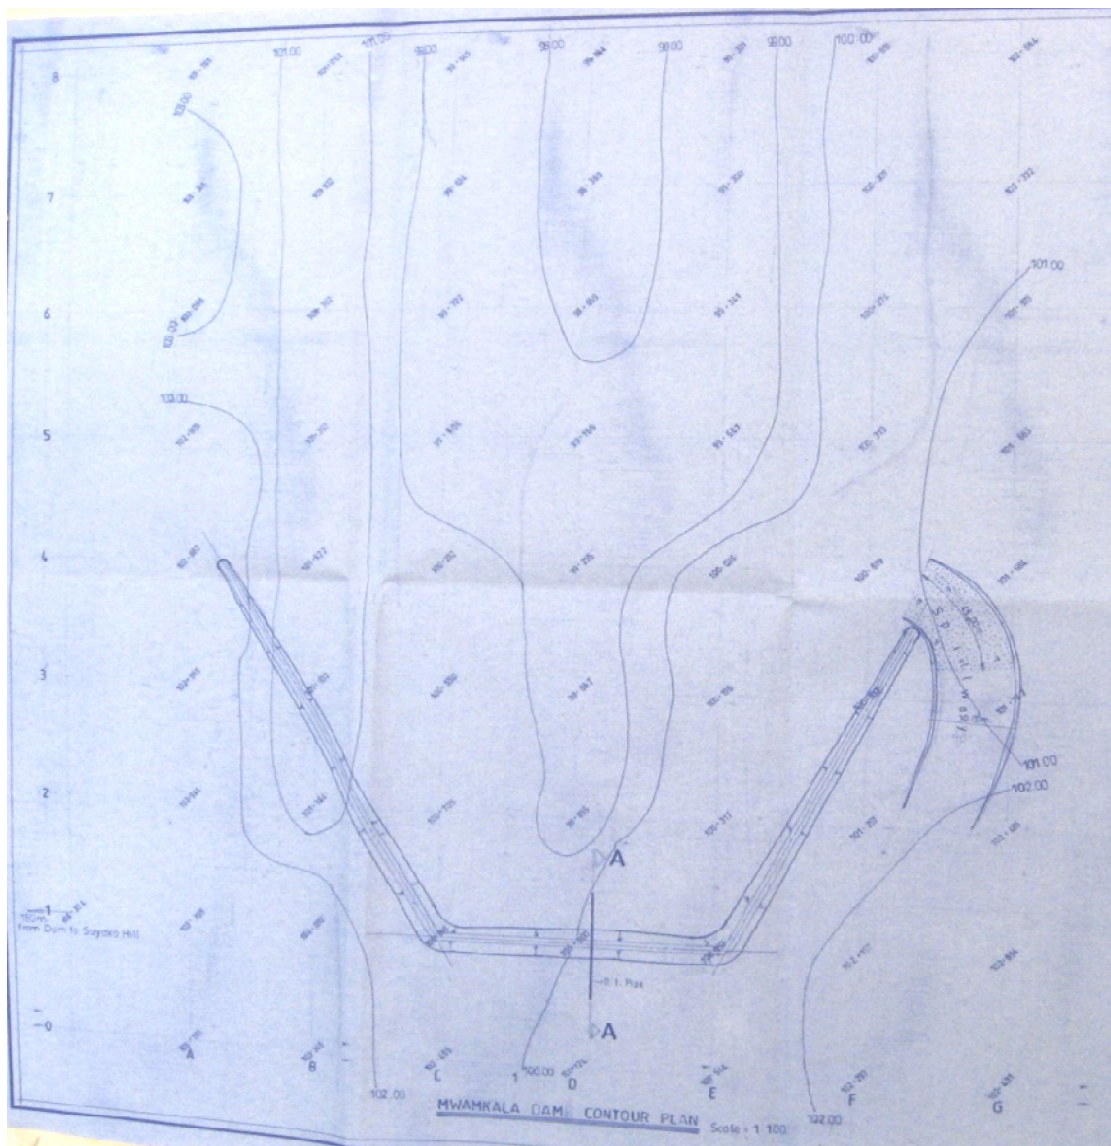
Contoured layout plan of Mwamkala Charco Dam
